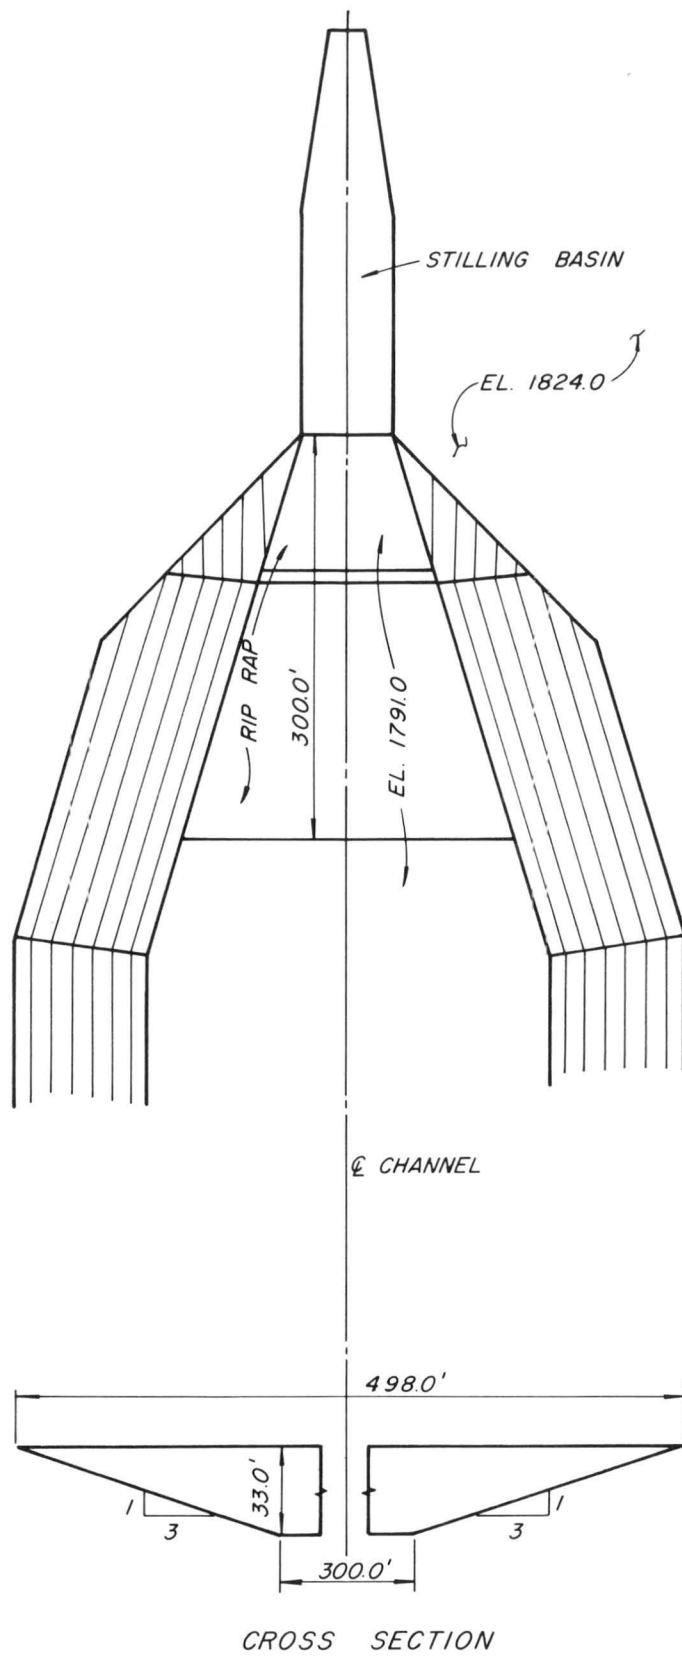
CHANNEL PLAN AND CROSS SECTION
